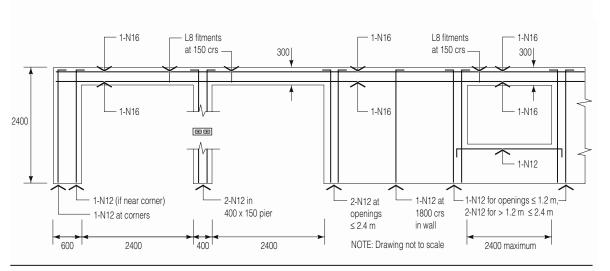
Wall Reinforcement for 140-mm Leaf for Wind Classifications N4 and C1 and 2400-mm Wall Height
